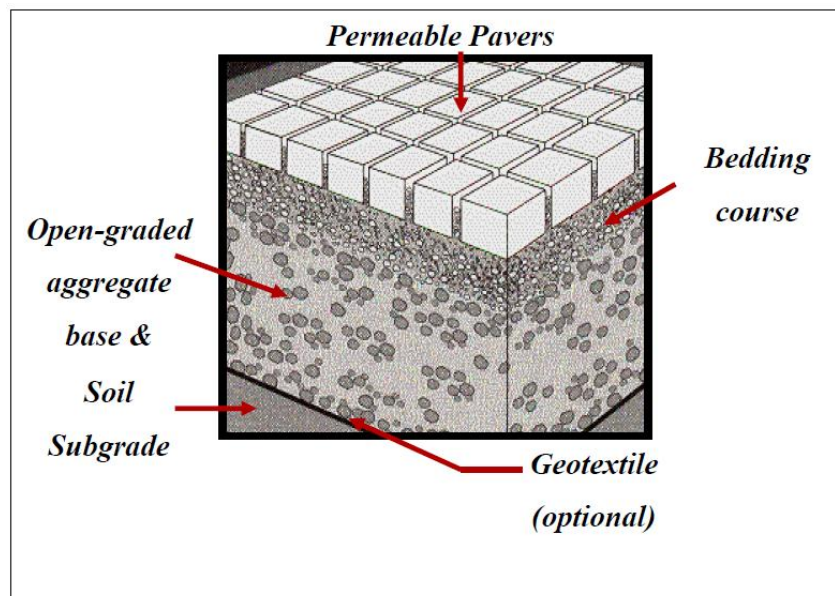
The structure of a typical permeable pervious pavement (Zhang, 2006)
